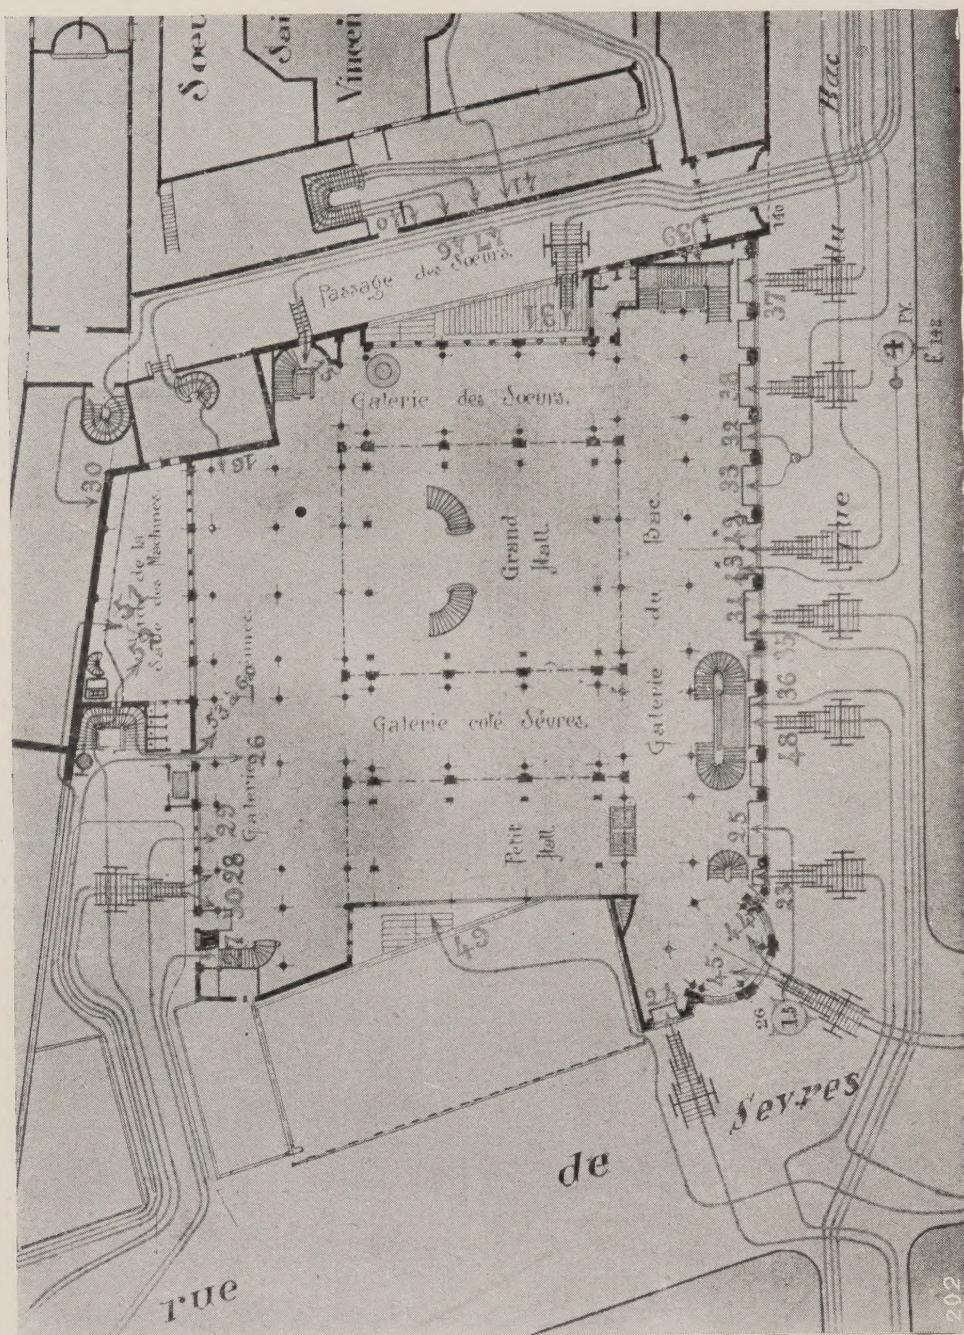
Plan shewing the Ground Floor of the building and the position of the fire ladders and jets.
